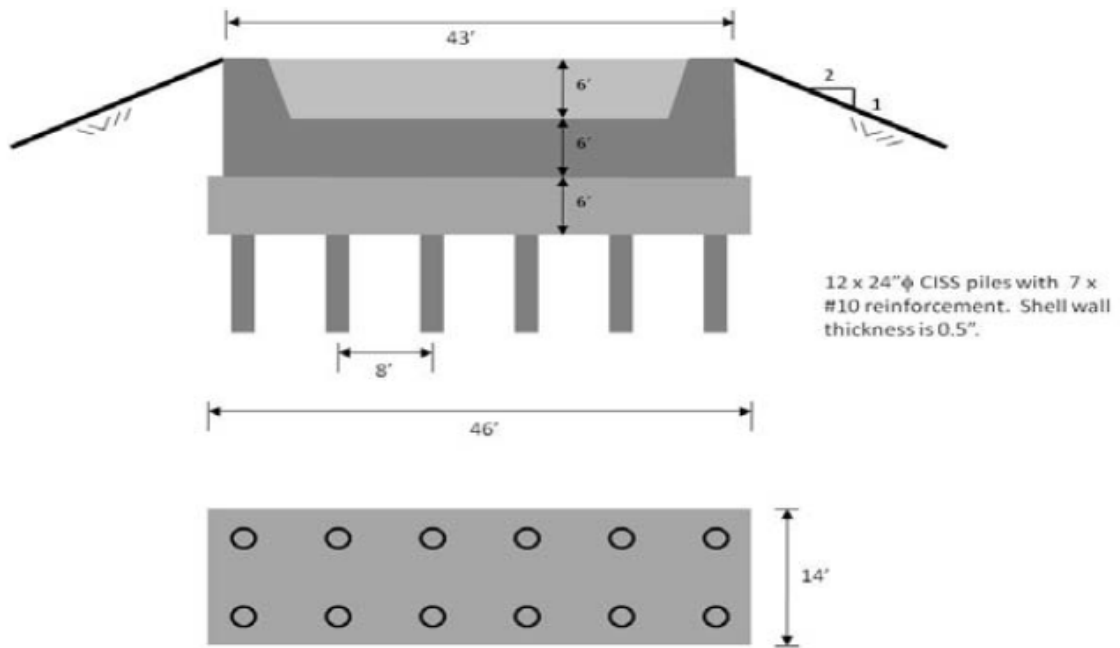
Abutment pile foundation arrangement with 8-foot pile spacing (side view & plan, after Shantz 2013)
